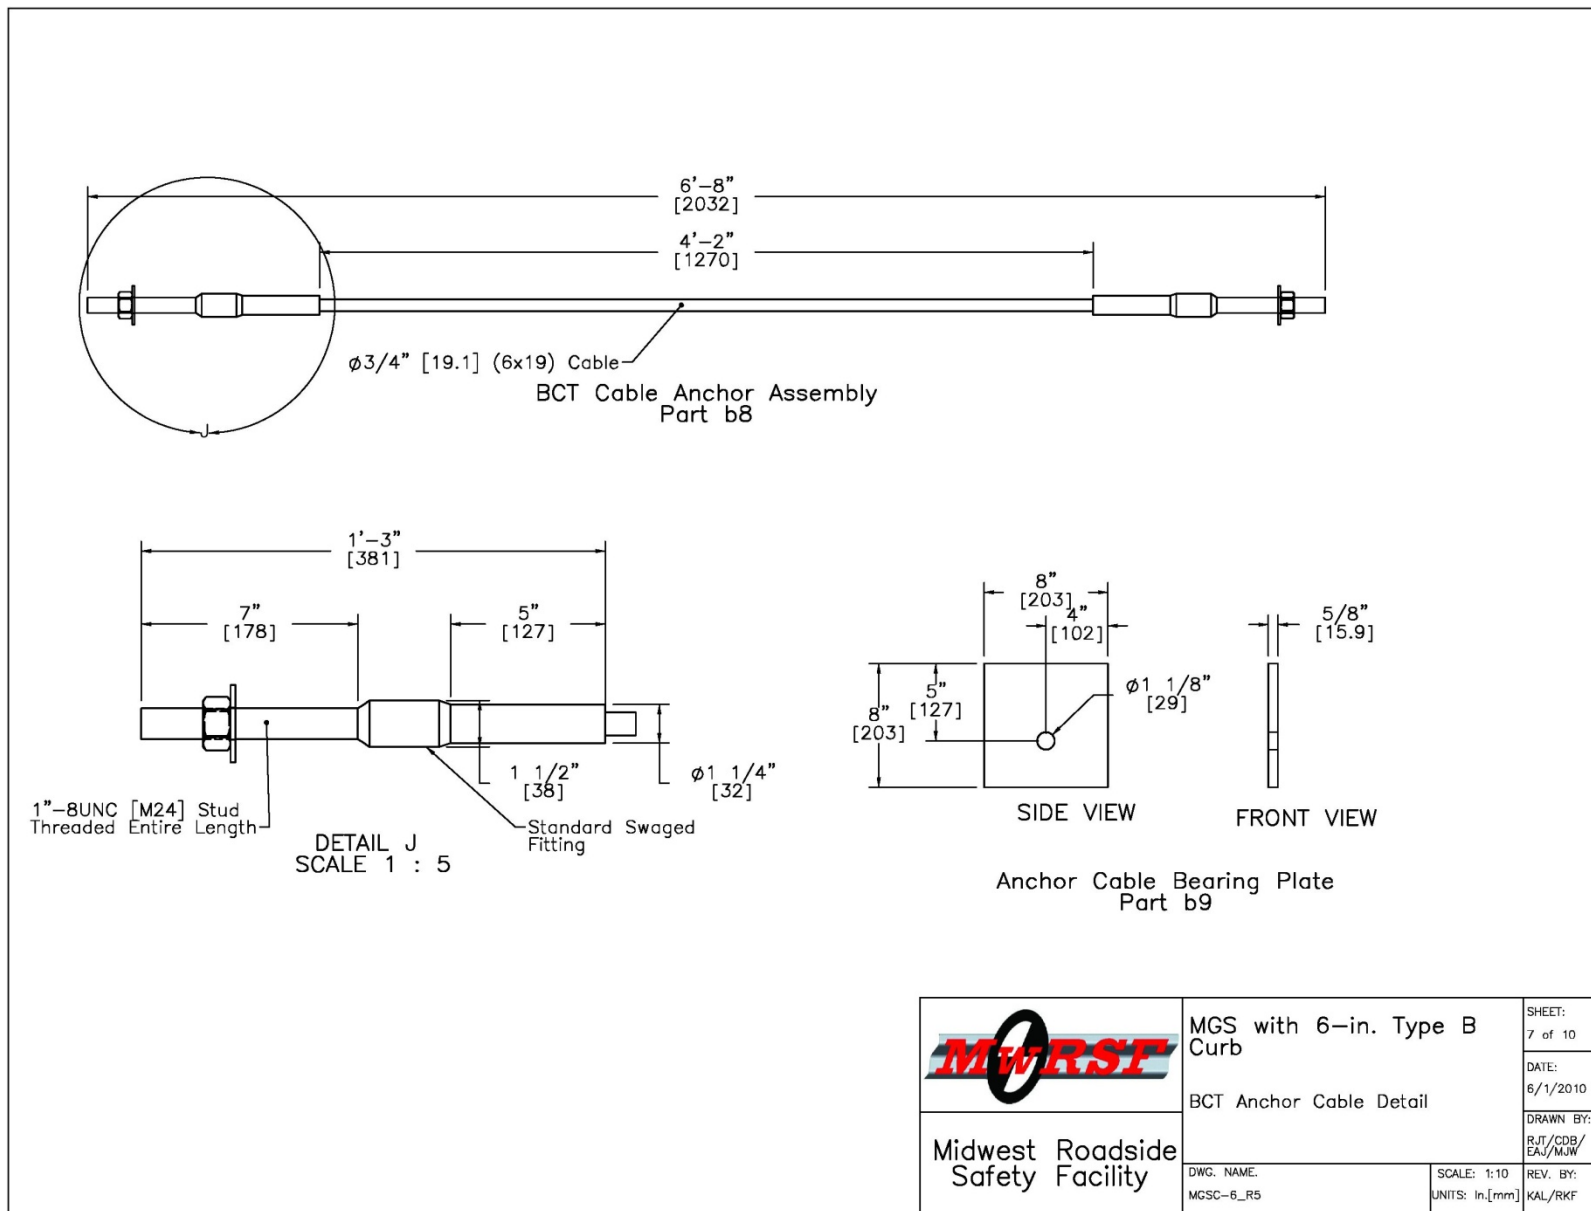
BCT Anchor Cable Details, Test No. MGSC-6
